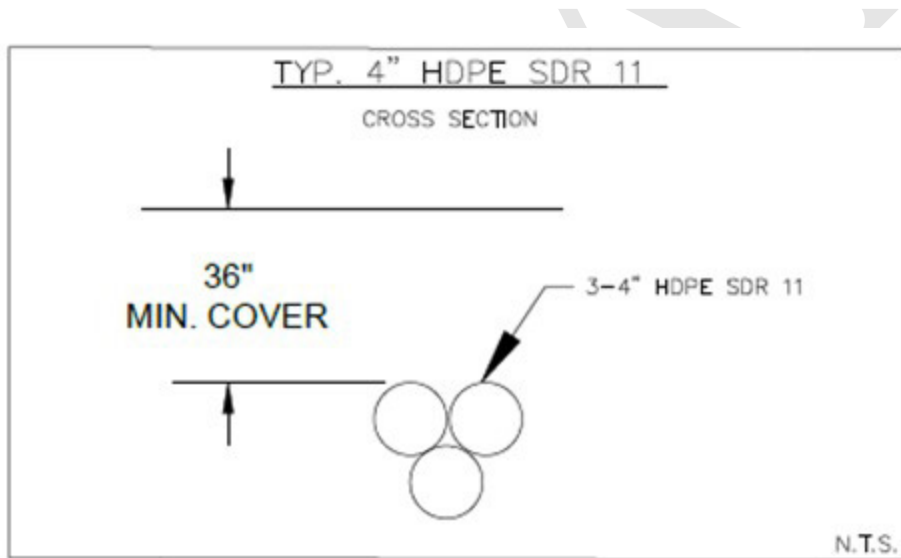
Typical Section for Massey Way Road Utility Conduit.
